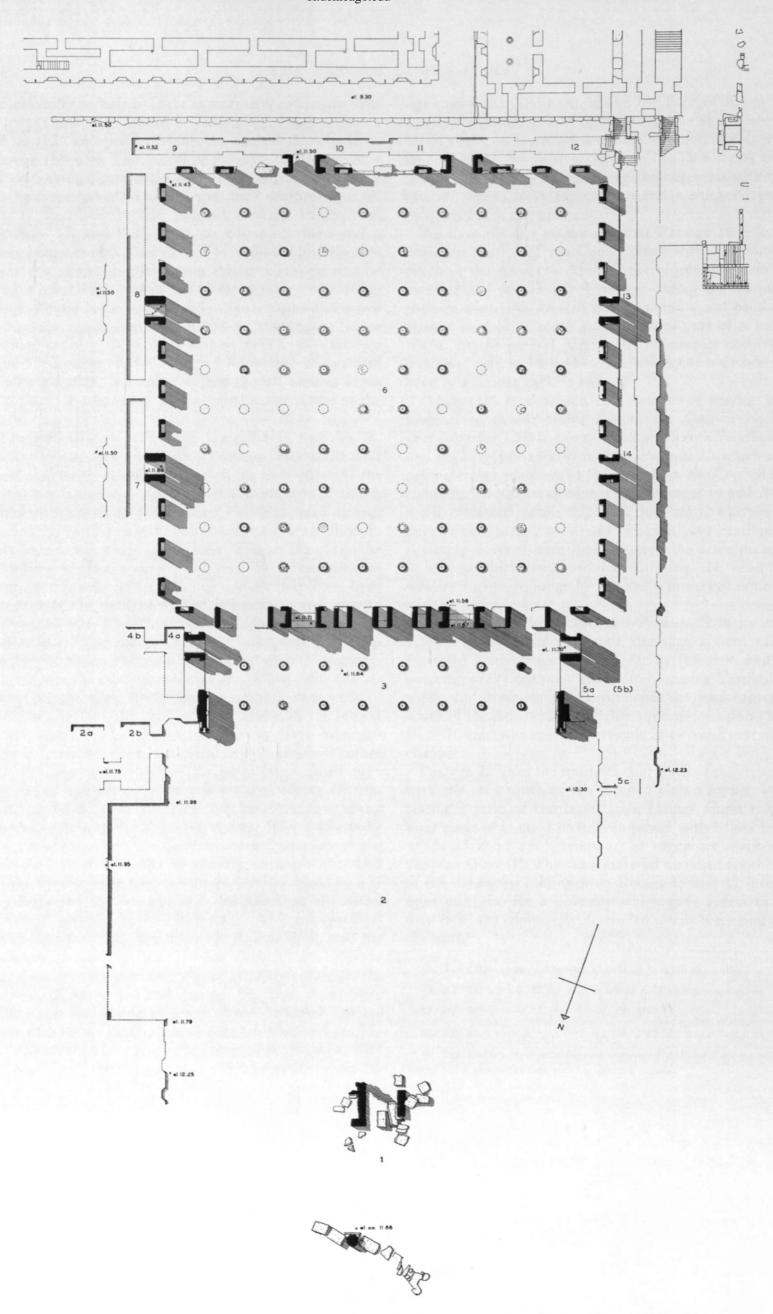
Plan of Extant Remains of Throne Hall. Scale, 1:600
